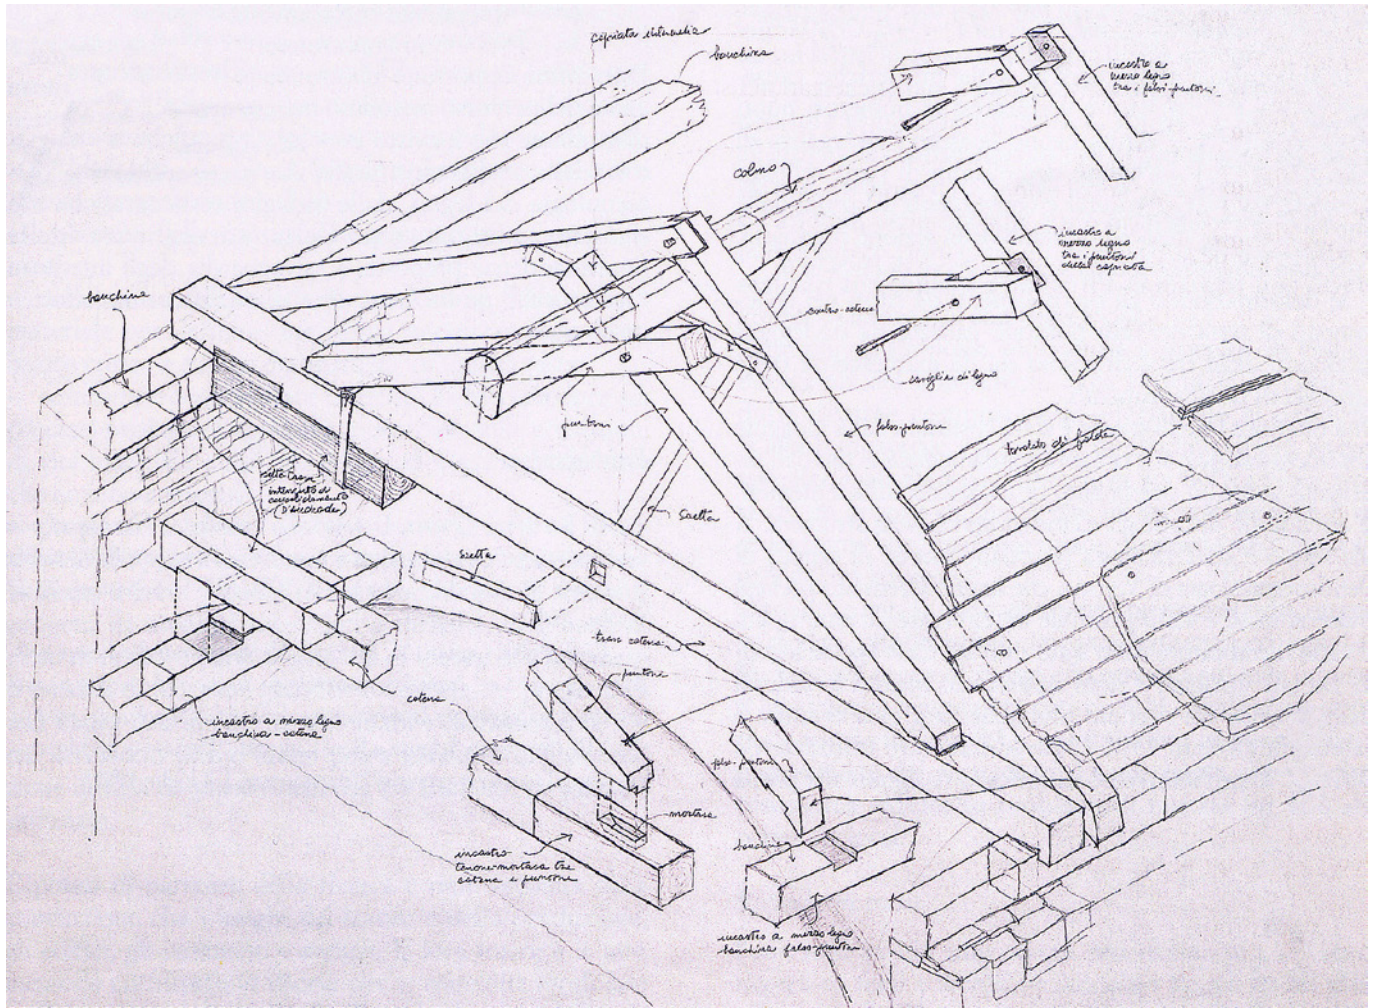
Church of San Giovanni Battista in Salbertrand. Construction survey of the timber roof structure and the typical wooden joints. (Image source: drawings courtesy by C. Bertolini-Cestari).
